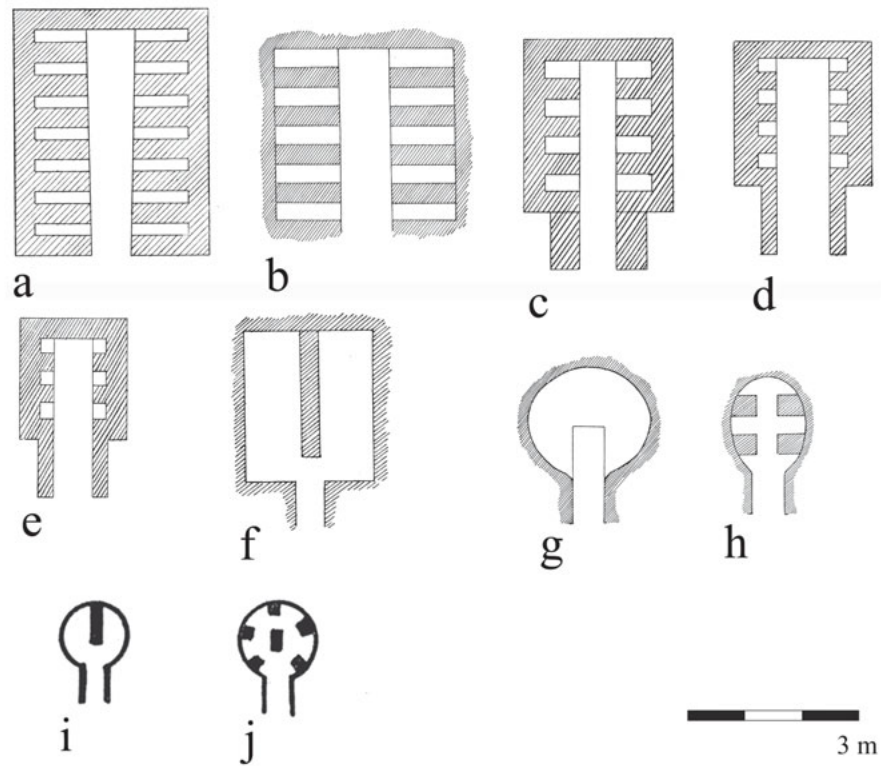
Ground-plans of the kilns from the 'Gas Works' (site 4).
